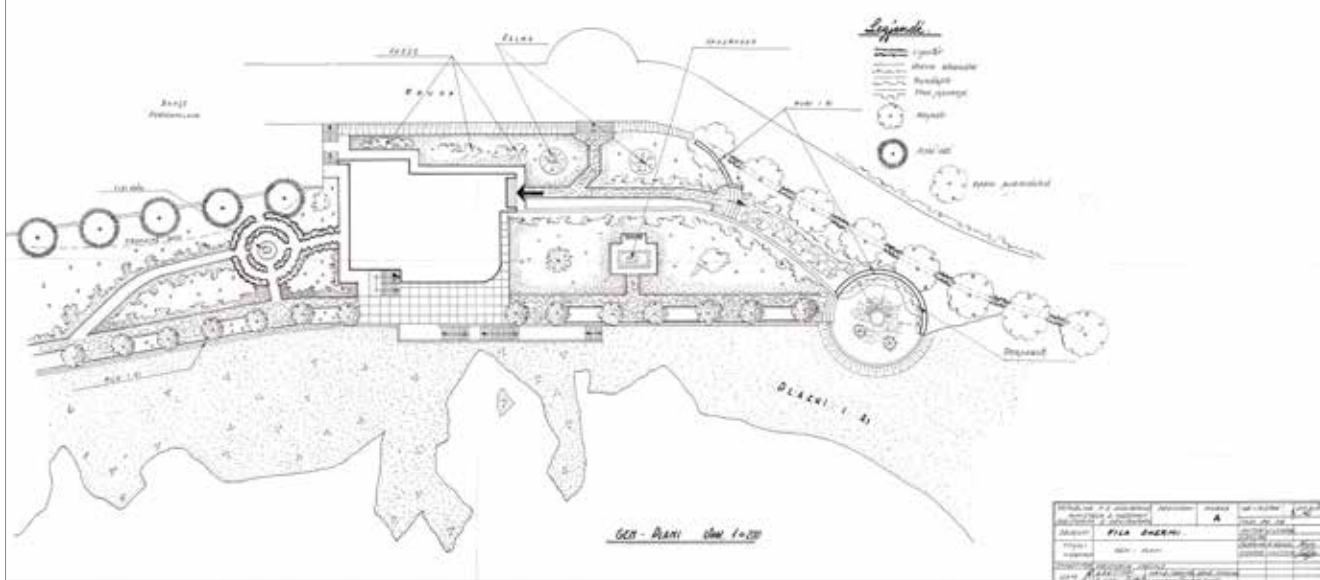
Skënder Luarasi, Villa in Dhërmi, Vlorë, 1962-63, construction document, site plan (TCAC)
